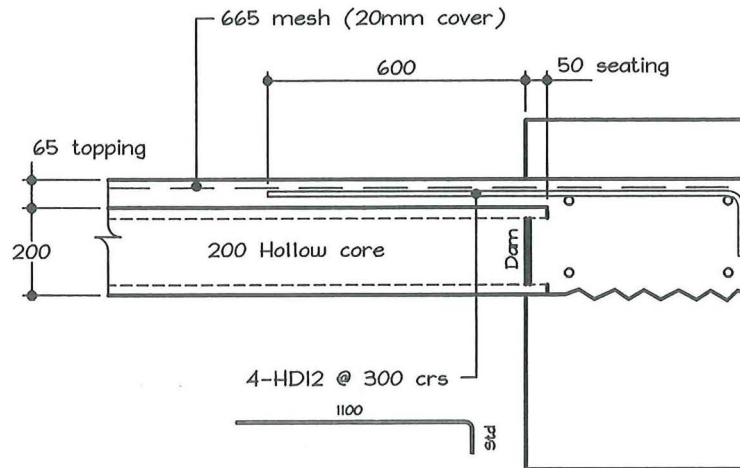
Support configuration of LOS tests that involved typical starter bar details
